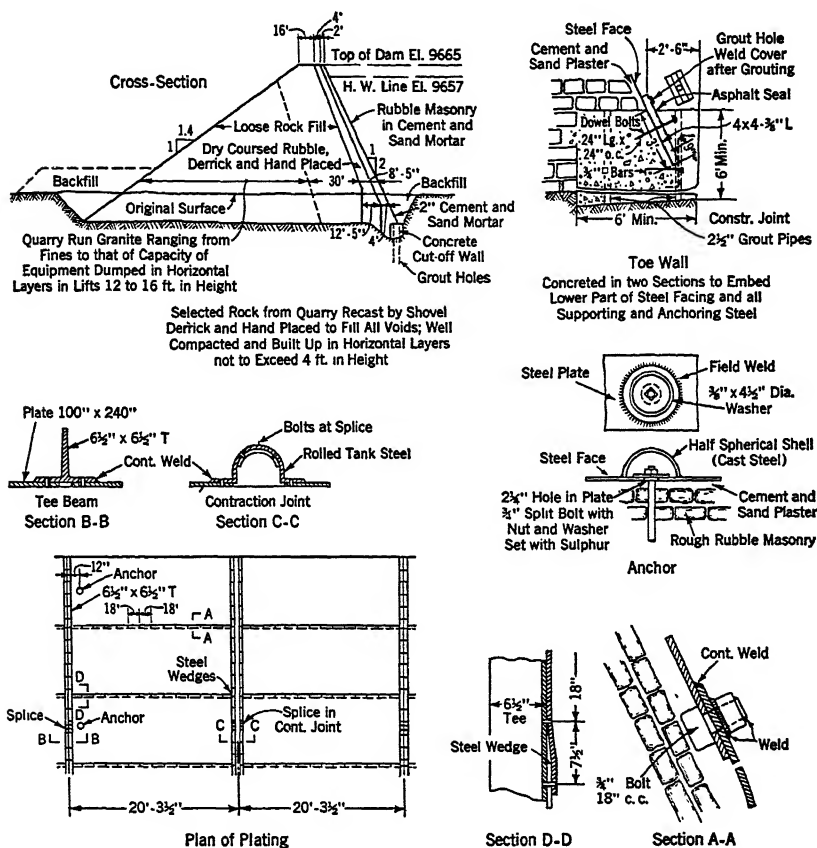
Penrose-Rosemont rock-fill dam. Note the steel plate upstream face. (*Eng. News-Record*, Vol. 108, p. 761.)
